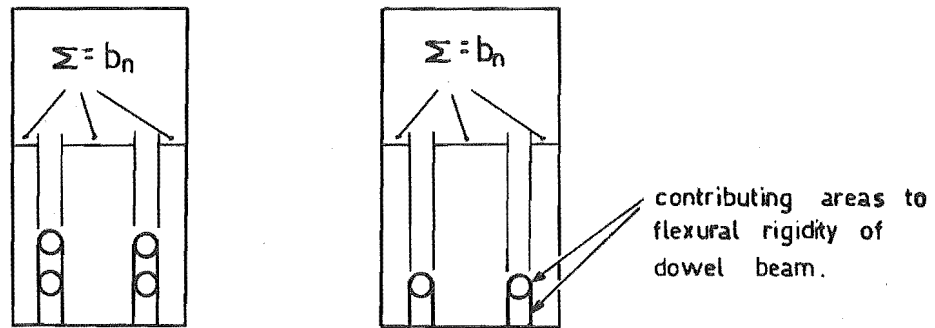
AREA OF THE DOWEL BEAM AFTER CRACKING
